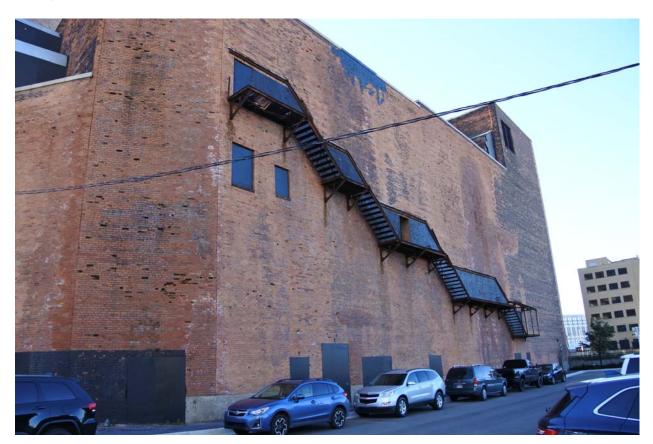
Exterior view from parking lot off North Adams. The exterior brick shows stains where water has leaked into the wall from failed roof flashings at parapet. There are many bricks missing throughout the full height of the wall, (especially at the corner), There is significant staining throughout indicating water intrusion, and severe damage at the top six feet of the wall below the parapet and coping. We estimate 50% of the brickwork here should be removed and replaced to properly correct the damage to the exterior walls shown here. The fire escape is also unsafe and should be removed or repaired. The parking lot along this wall should be fenced-off so cars cannot park along the wall here and potentially damaged by falling masonry.
